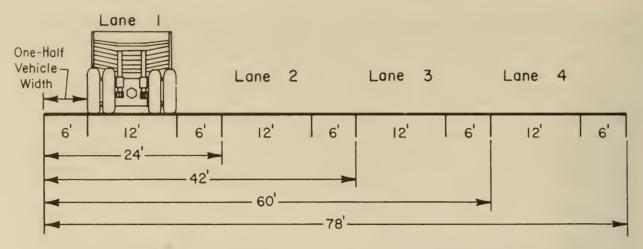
Typical haulageway sections for 12-foot-wide vehicle.
